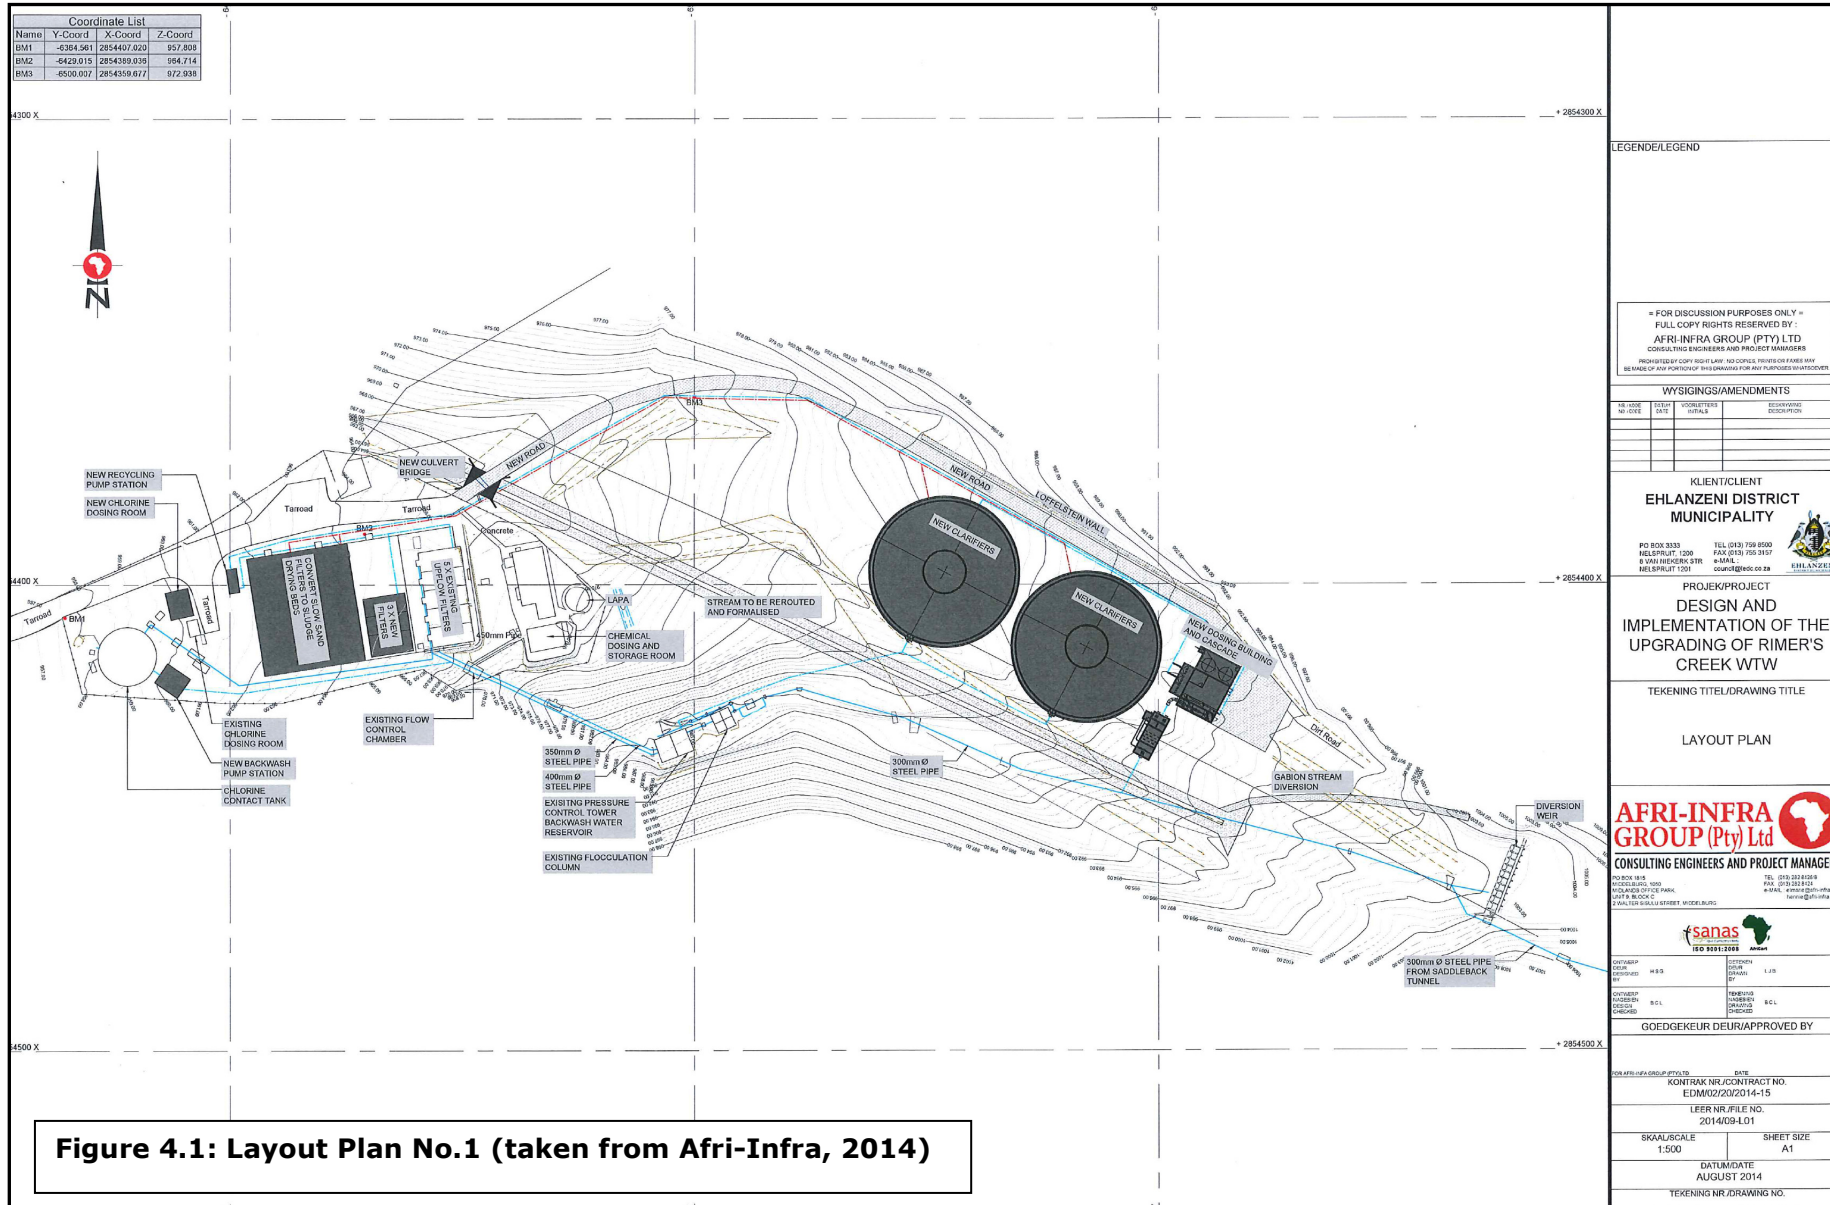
Layout Plan No.1 (taken from Afri-Infra, 2014)
